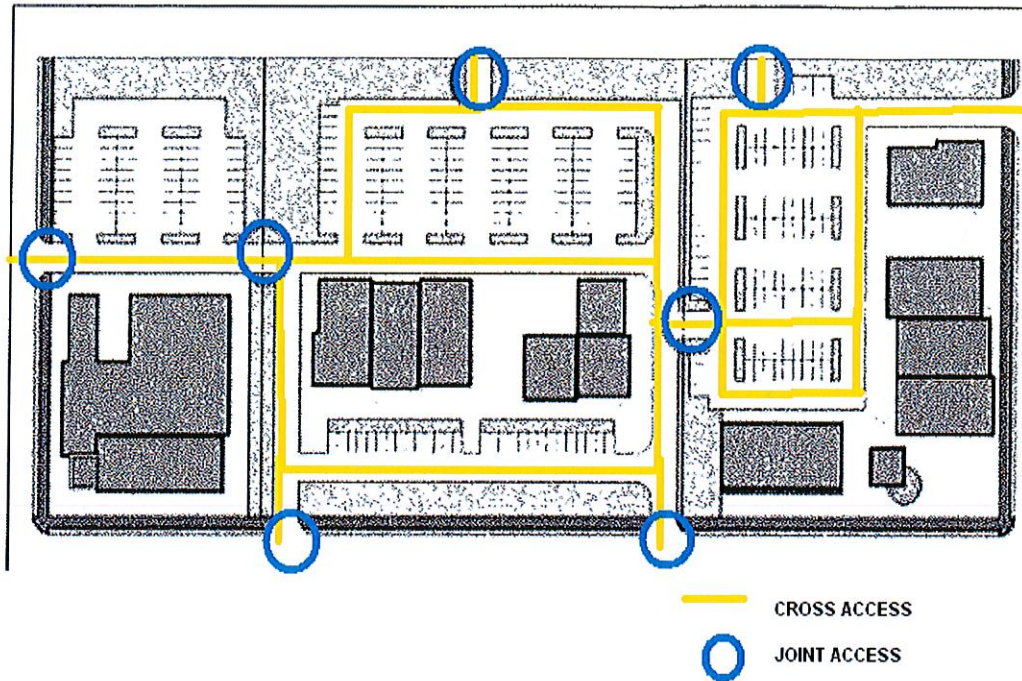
Cross access between parking areas and adjacent properties. Joint access through the use of common driveways entrances and between properties.
